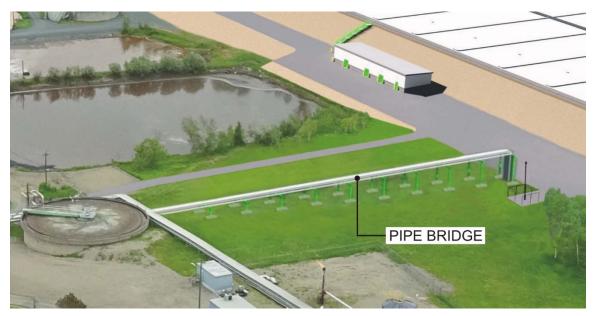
Three-dimensional model looking east towards the pipe bridge proposed for the Lake Utopia Paper Mill in Utopia, New Brunswick.
